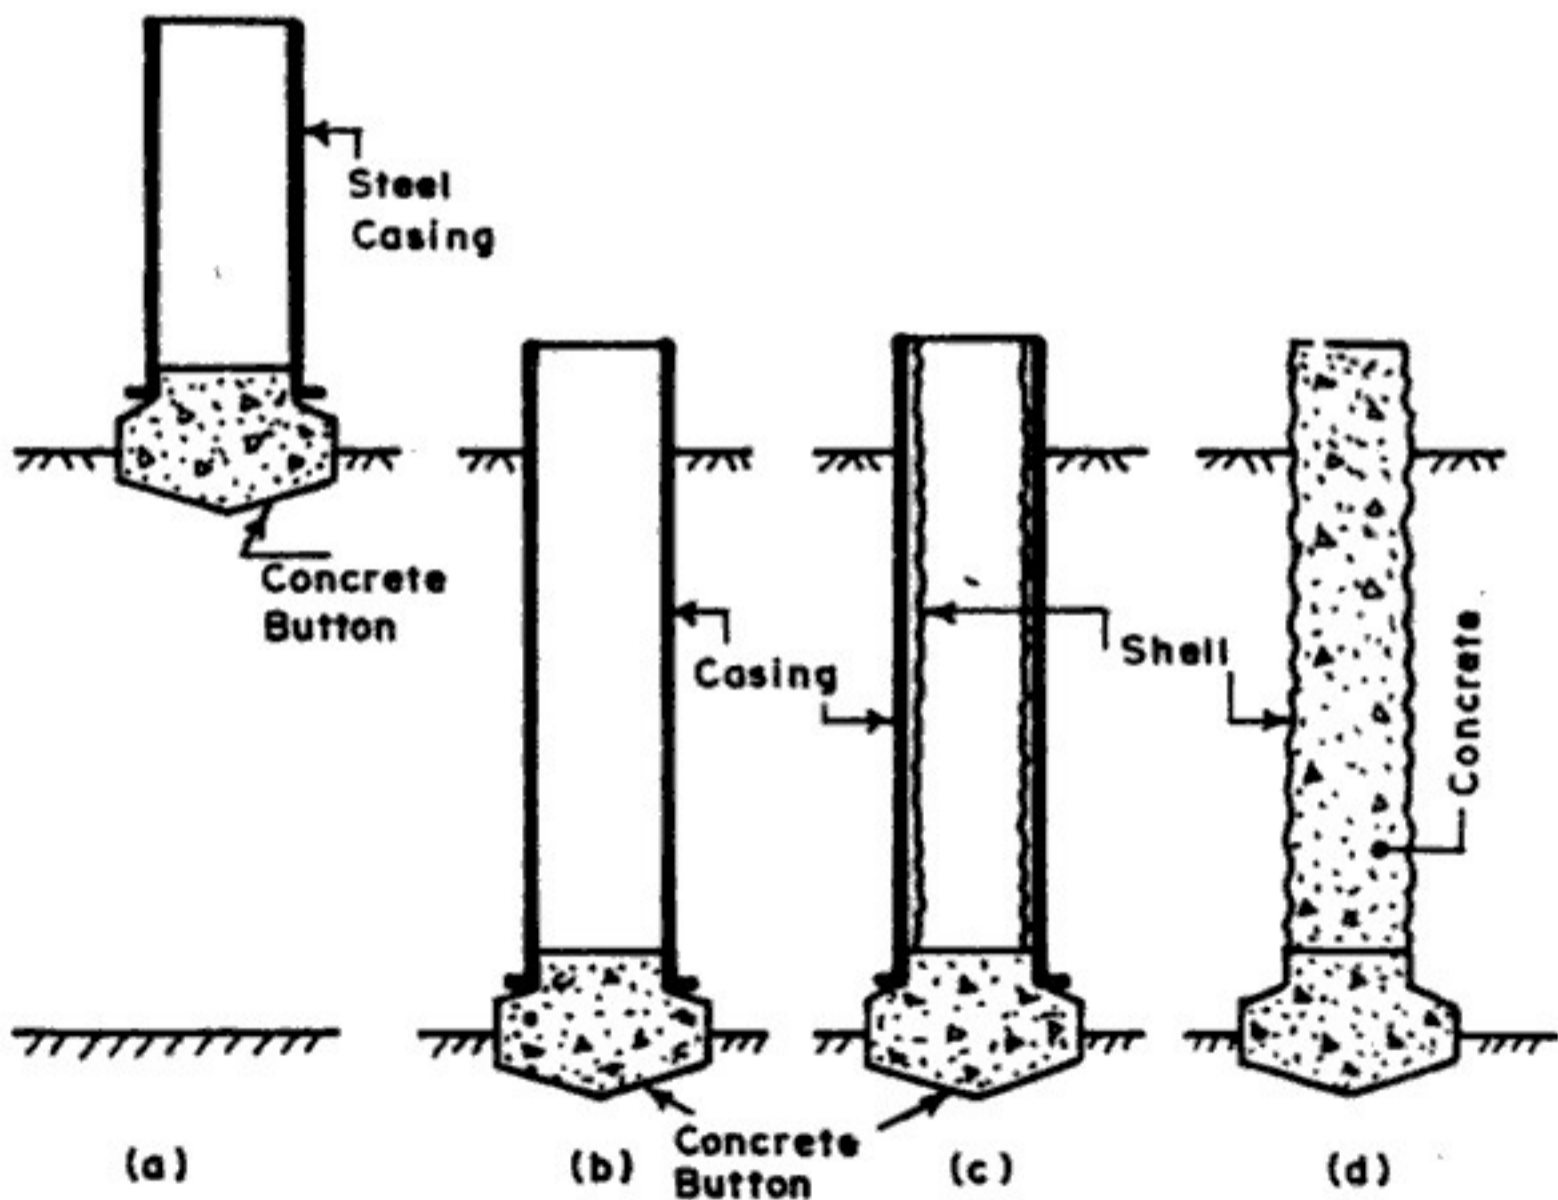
STAGES IN BUTTON-BOTTOM PILE CONSTRUCTION.
